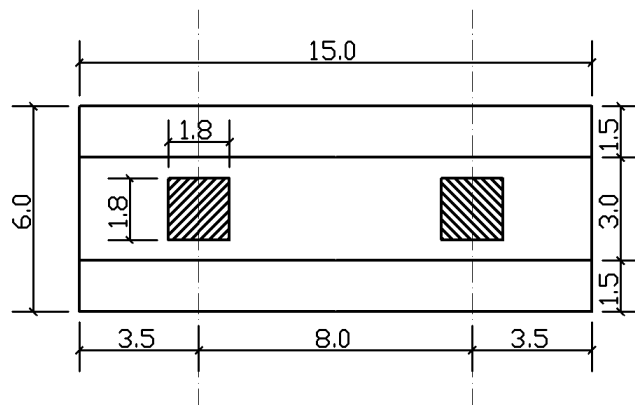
Alharamain Bridge Piers #2, Pier #3, Pier #8, and Pier #9 footing details (Dimensions in meter).
